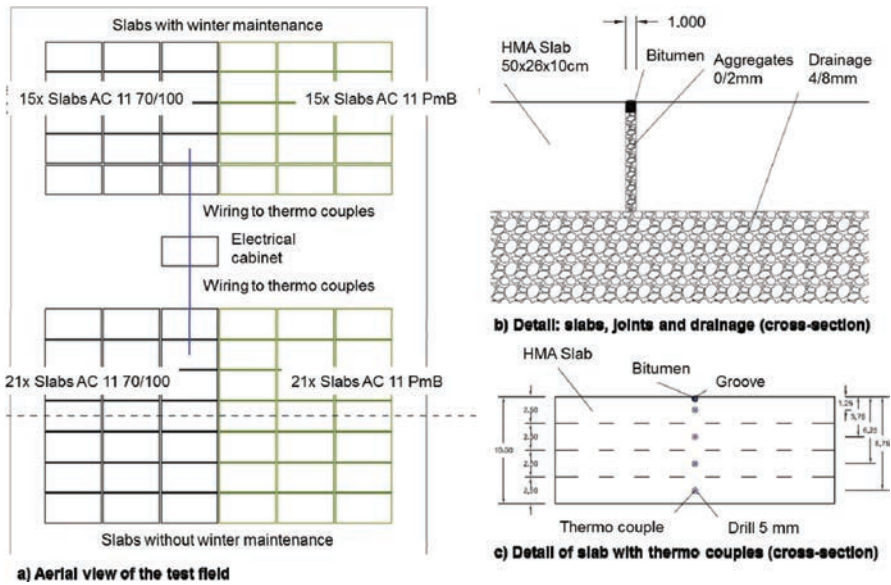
Details of the test field: a) aerial view, b) detail of slabs, joints and drainage, c) detail of instrumentation.
